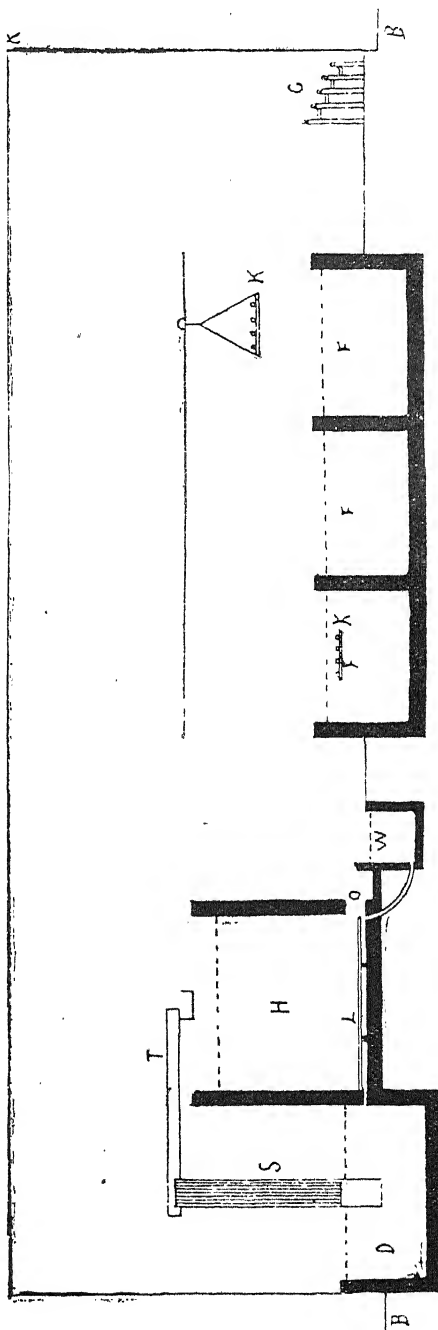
VERTICAL SECTION OF PLAN SHOWN IN FIG. 11.
